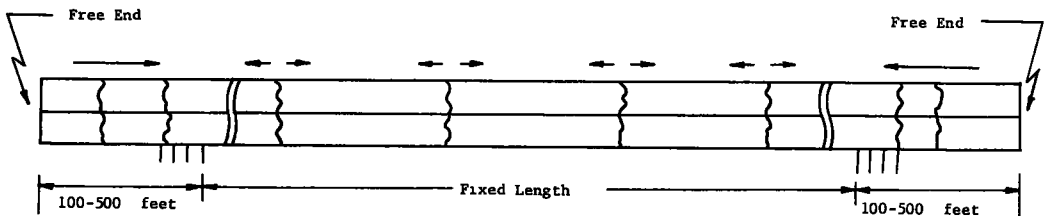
Pavement response to contraction forces. (Expansion forces will reverse the direction of strain.)
